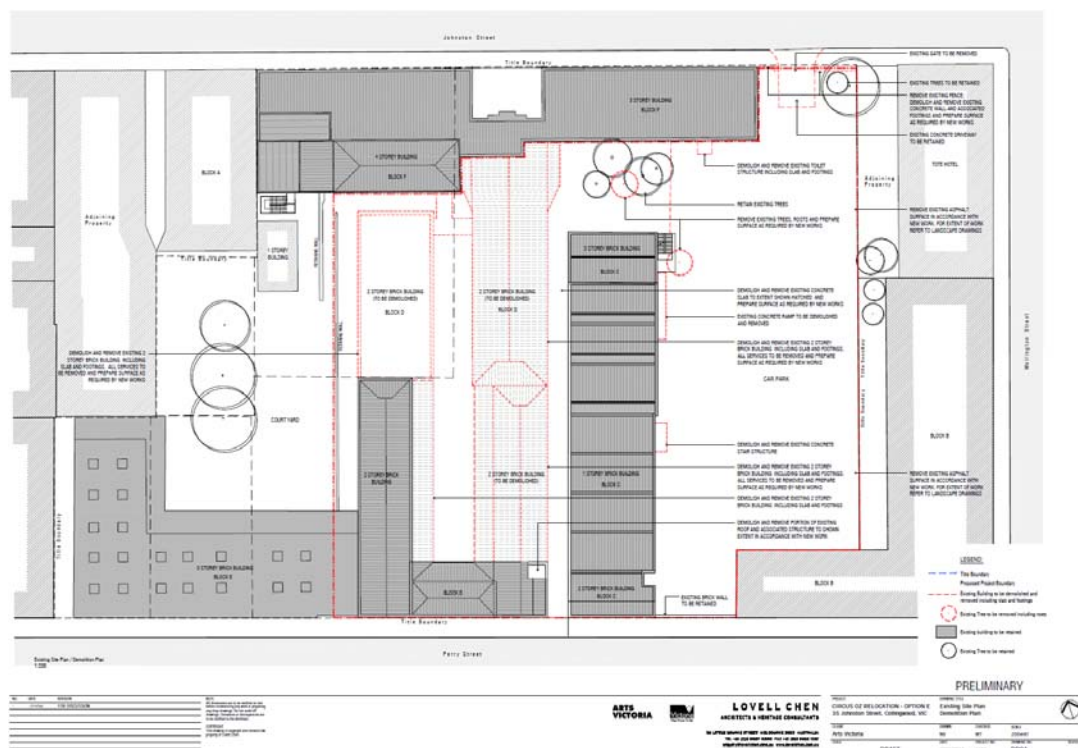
Buildings Proposed for demolition on the Existing Johnston St. Site
